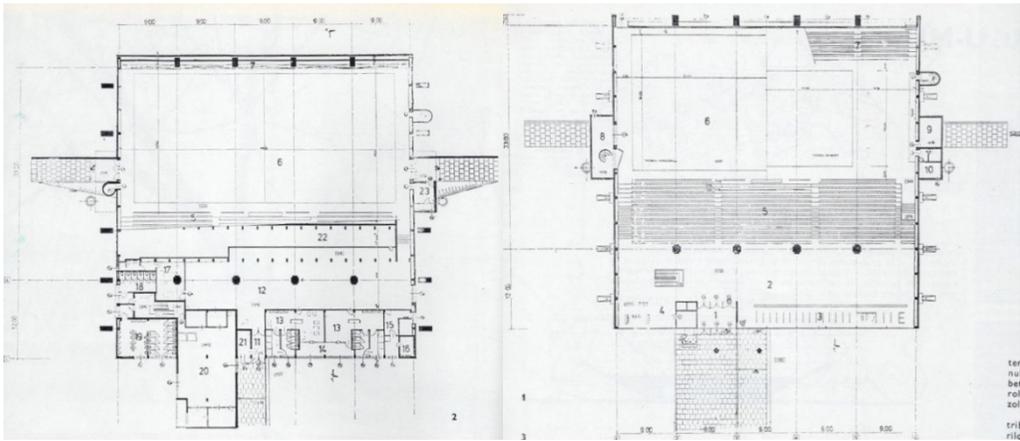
Playing field plan and public stands plan, source: source: *Architectura RPR*, nr. 1-2, 1978, p.24.
